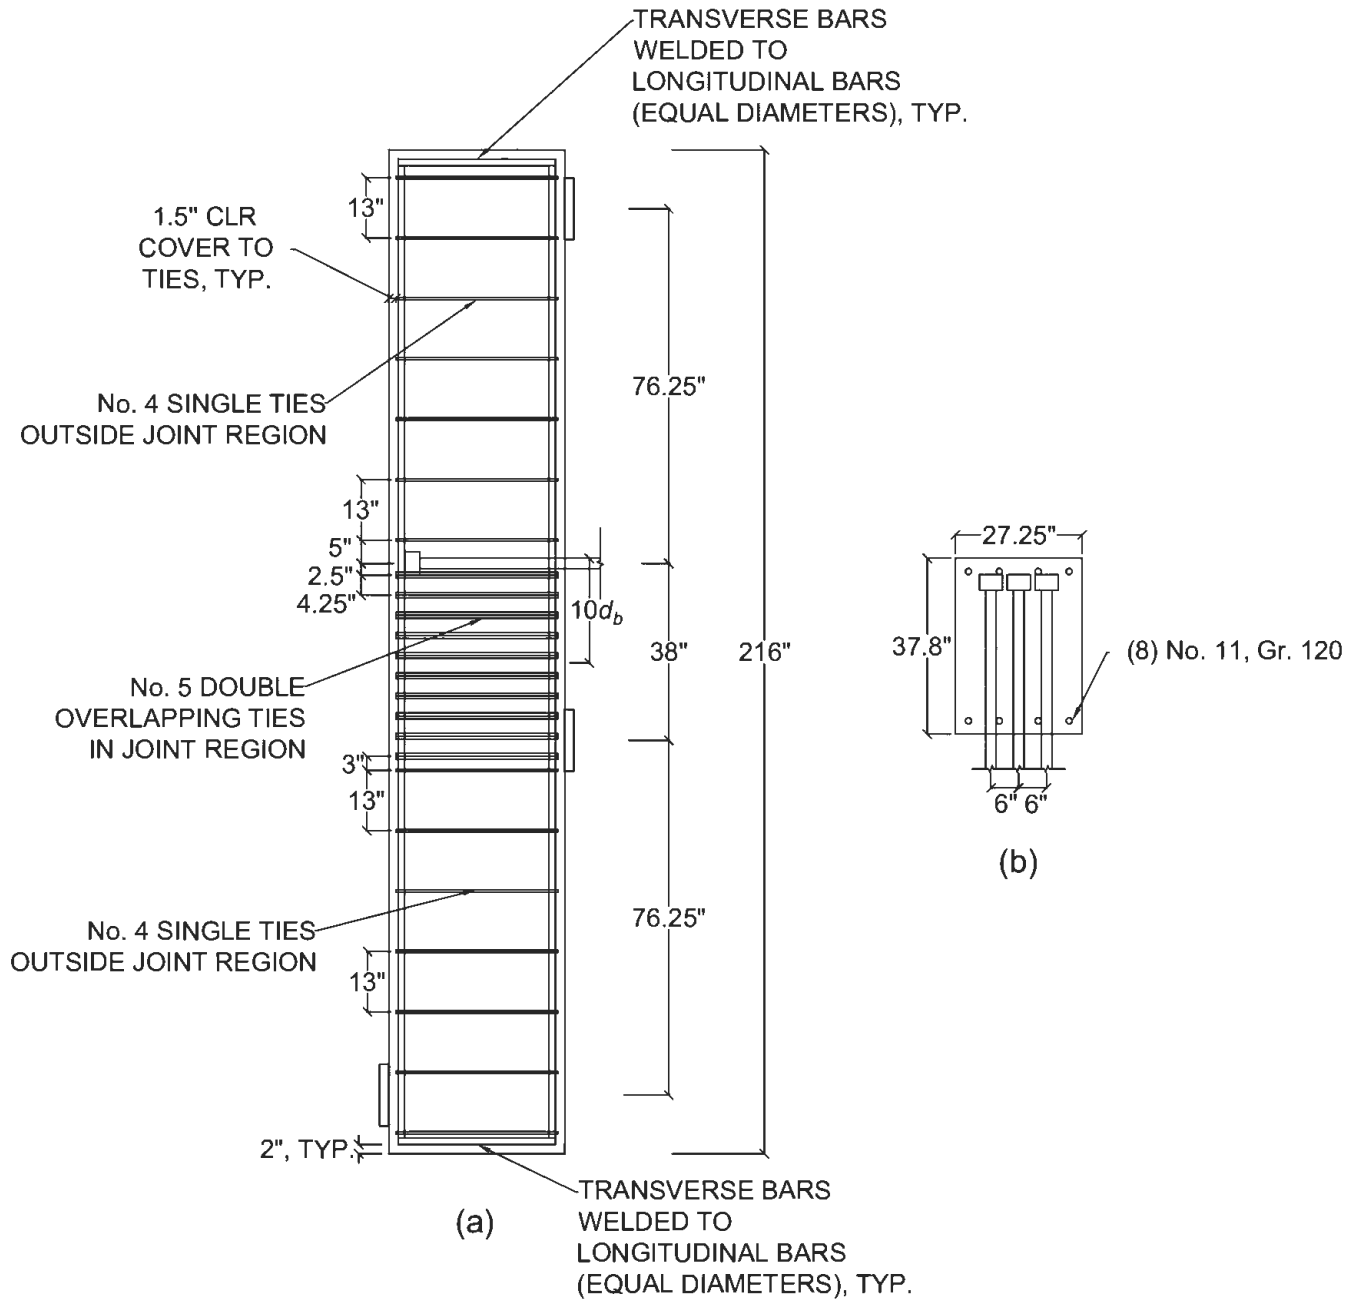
Details of reinforcement layout for No. 18 headed bar specimen 18-7: (a) elevation, (b) cross-section
